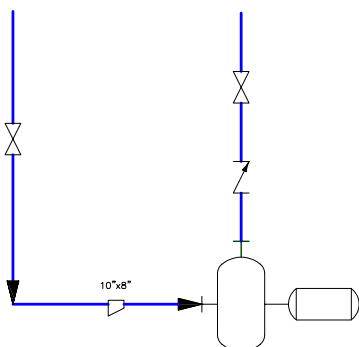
Check valve and gate valve placed on the outlet line of the first pump
